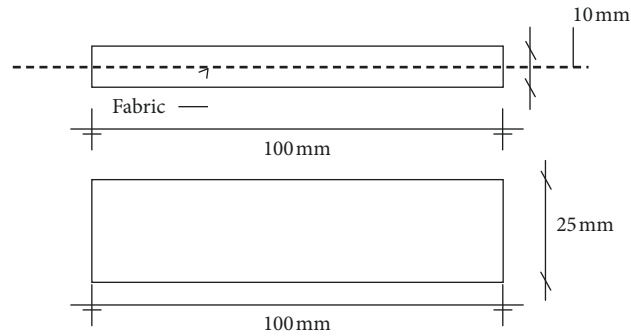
Fabric-reinforced concrete specimen dimensions.
